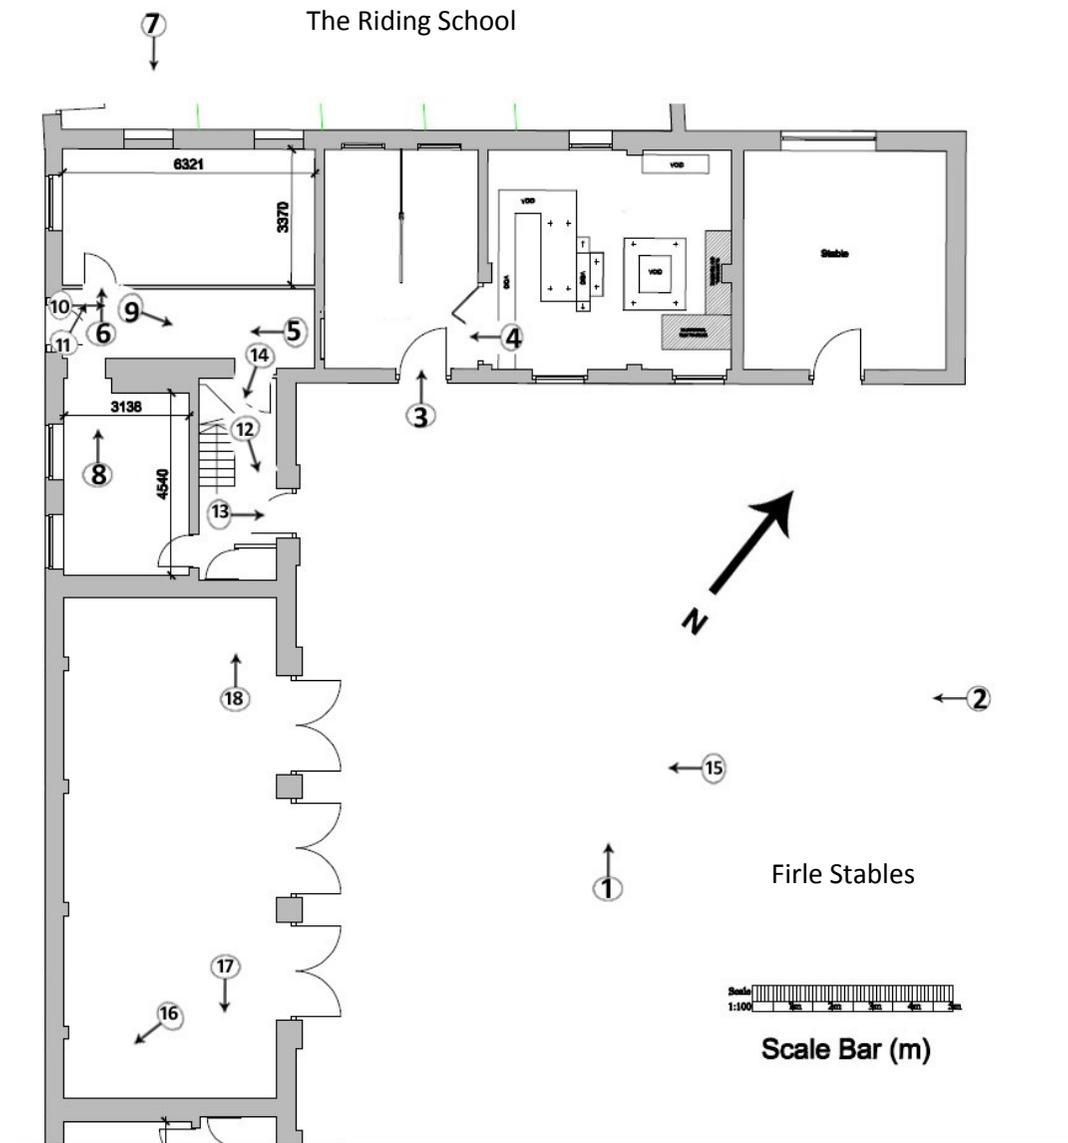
Ground floor plan and photograph locations based on architect's plan ©Glenn Moore Associates drawing number 1718/160/02.
